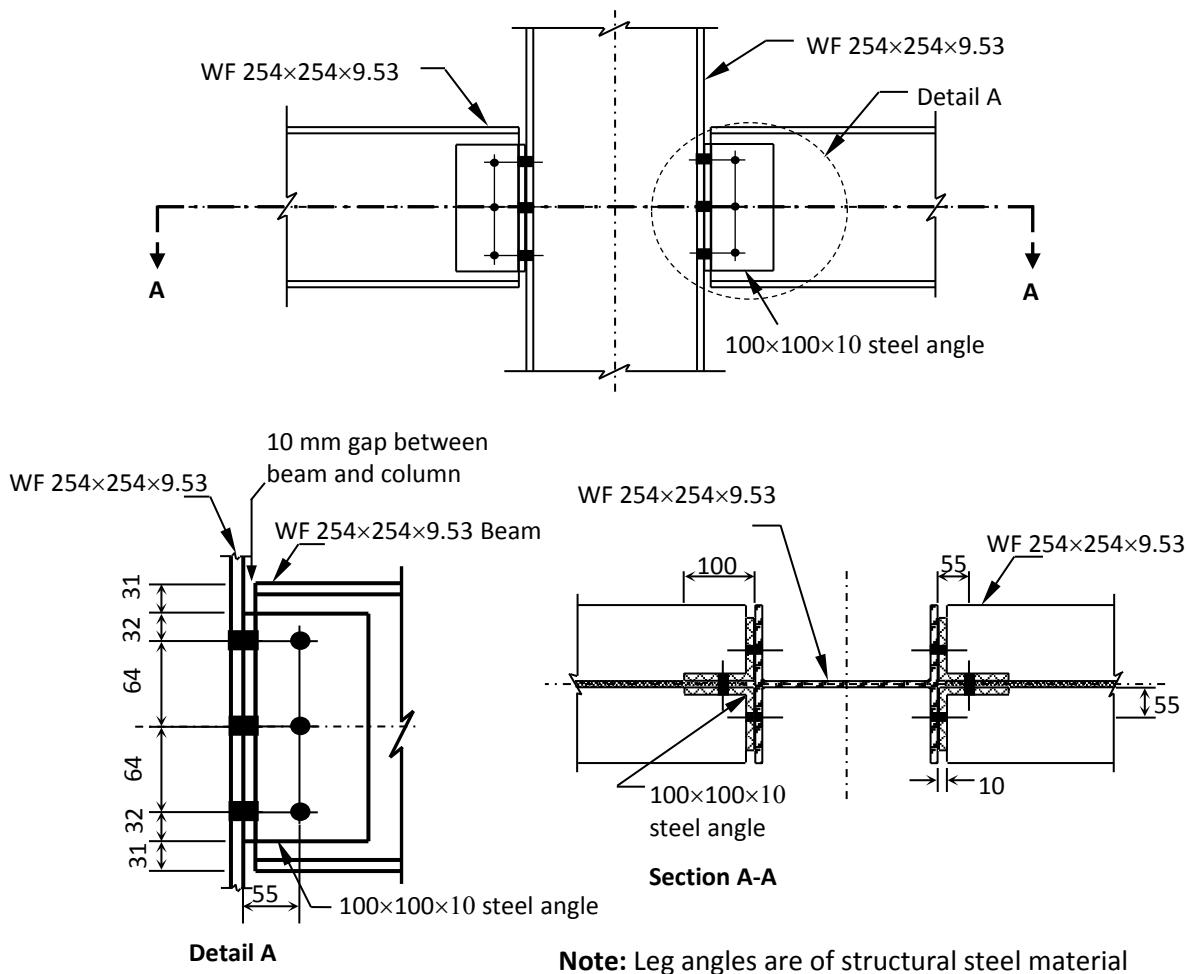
Connection details for beam-to-column joint tests with structural steel cleats
